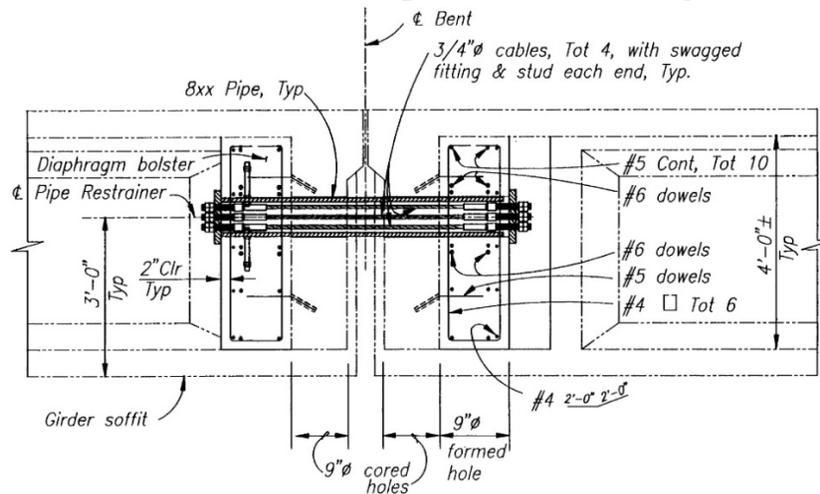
Retrofit at expansion joint location on Napa Slough Bridge.
